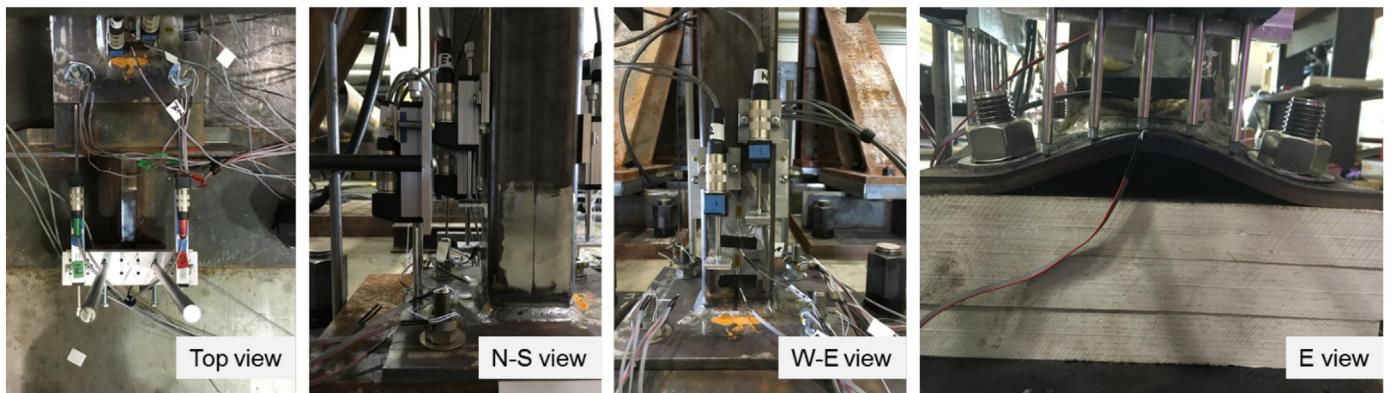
Photographs of instrumentation plan from top, North to South, West to East, and East (east view is on a deformed specimen, demonstrating how LVDT sensors are able to read vertical deformations of base plate).
